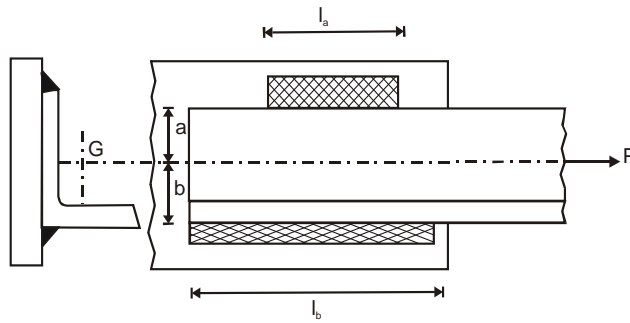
An Unsymmetrical Section Welded to Plate and Welded along Line of CG
